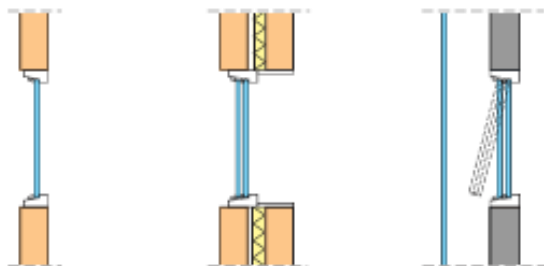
Single façade + glazing (l); Cavity wall & insulating glazing (m); Double skin façade & insulation glazing (r). [137]
